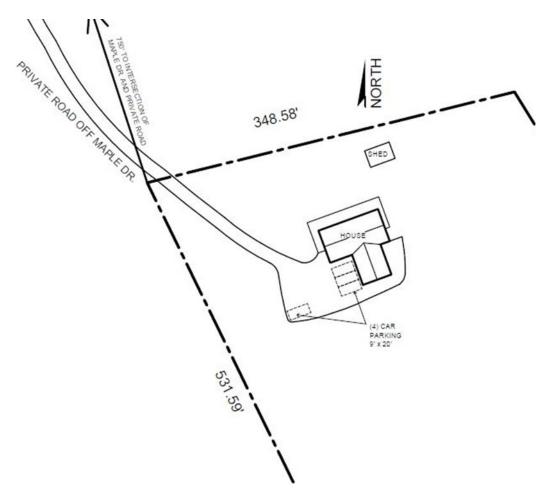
Site Plan – Designated Parking Spaces (9' x 20')
